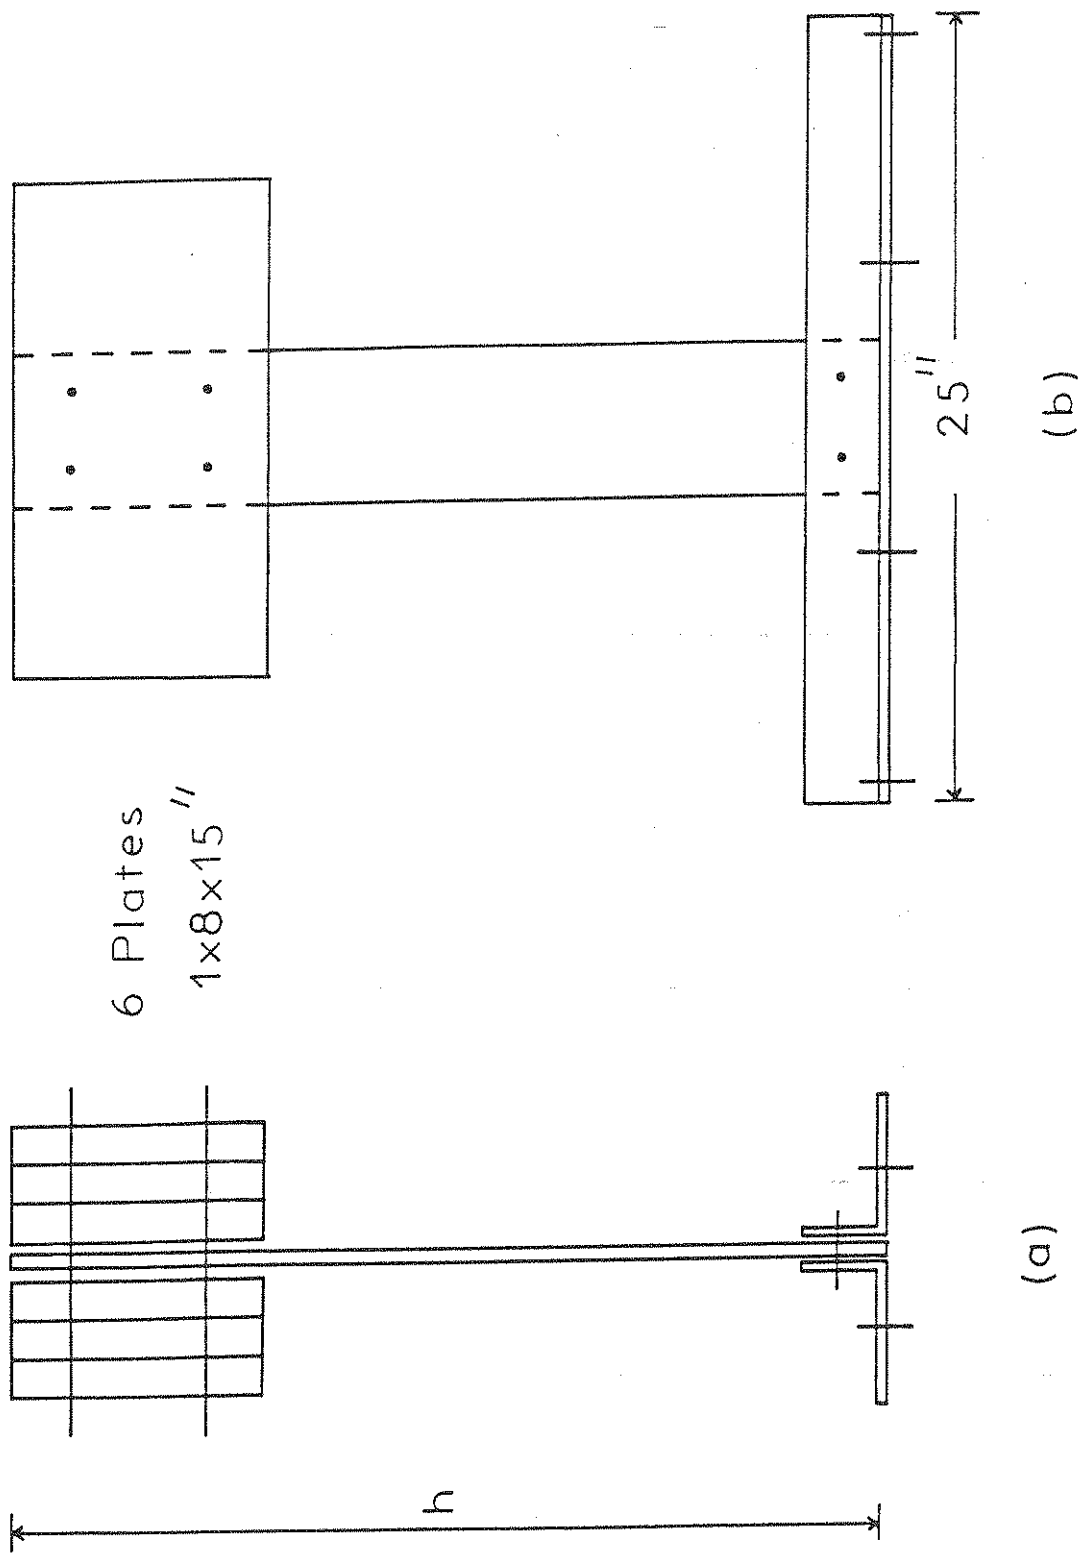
Damper B and Base Attachment System: (a) Front View (b) Side View
